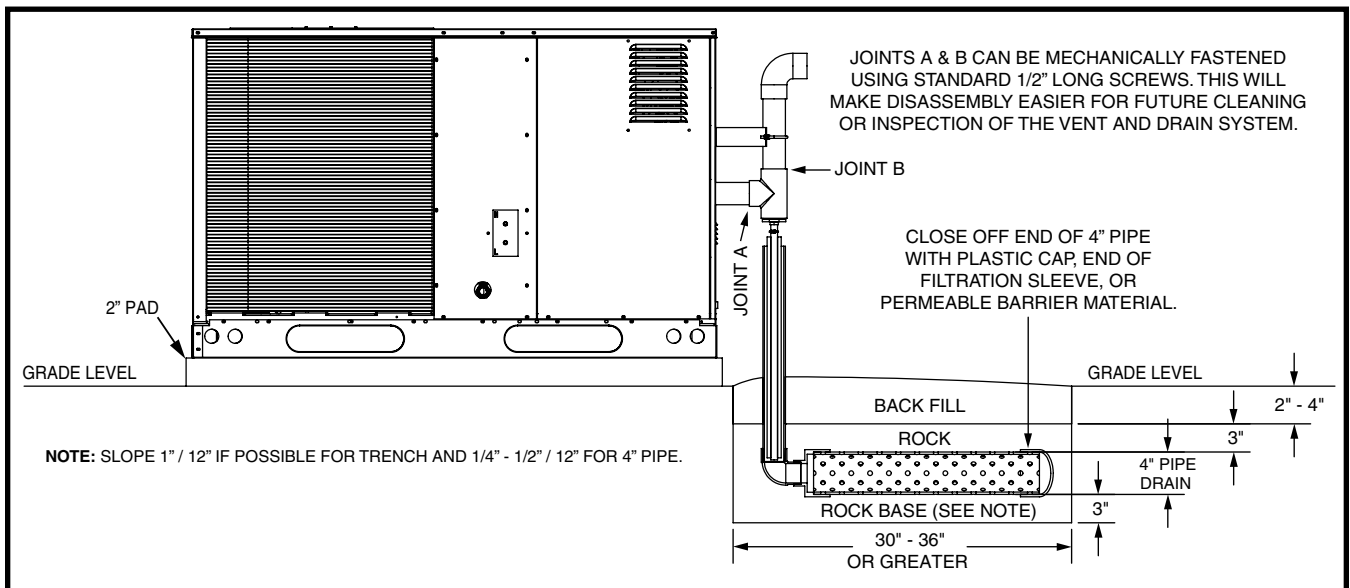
Condensate Disposal Using A Horizontal Drainage Trench
